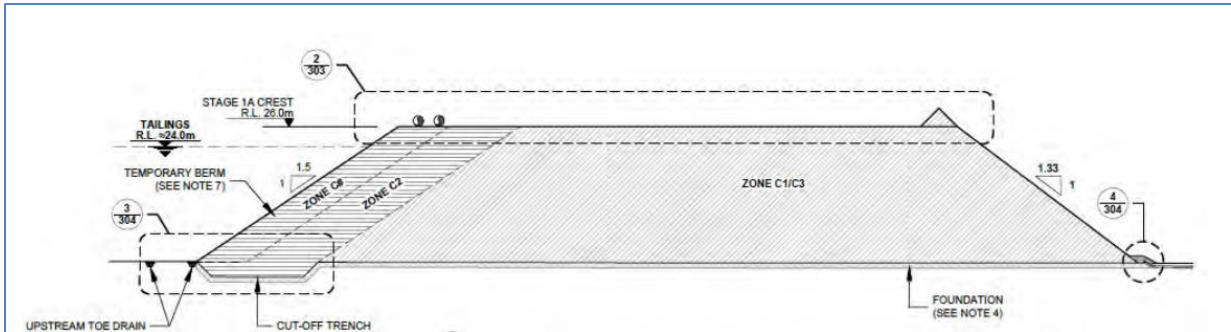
Typical Stage 1A west embankment section (where Zone C# is Zone C2 material)
